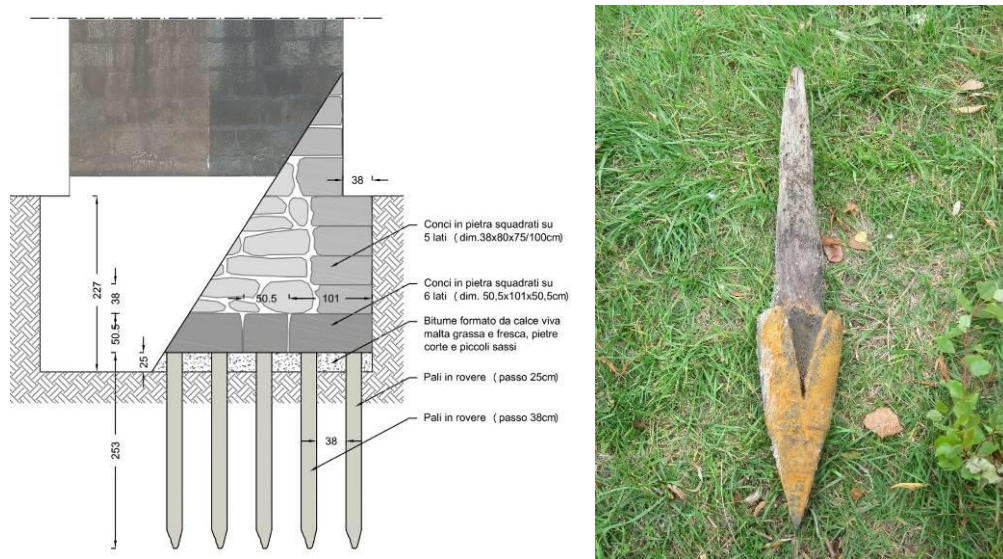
foundation construction in compliance with the “Chapters”; nailed poles recovered at Bassano bridge site (XVI-XVIII century)
